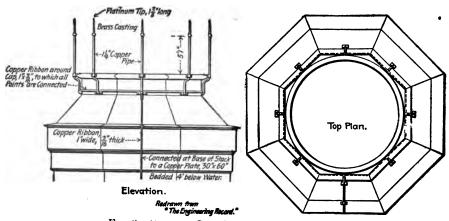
CHIMNEY CAP-LIGHTNING PROTECTION.
